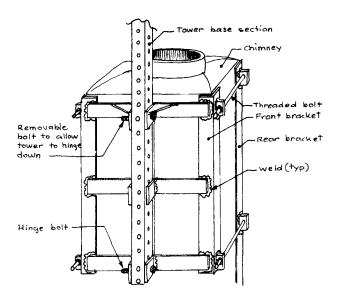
Hinge assembly, consisting of a front and rear bracket, is fastened with two 2-foot long threaded bolts.
